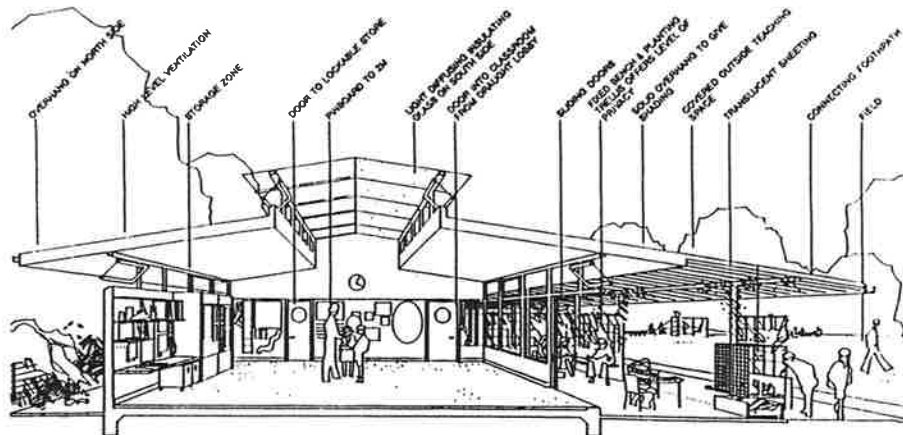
Sectional Perspective through a Typical Classroom. Rooflights have daylight insulation at the front and insulated panels at the rear; vertical lights are opening. Windows are plain double glazing.
